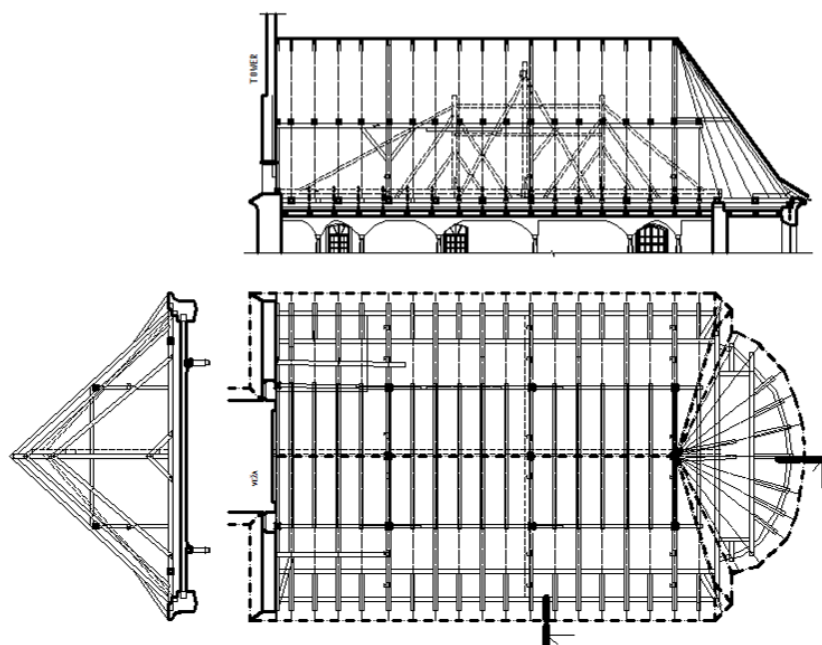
Plan and sections of the truss above the church, dashed lines indicate hanging trusses.
